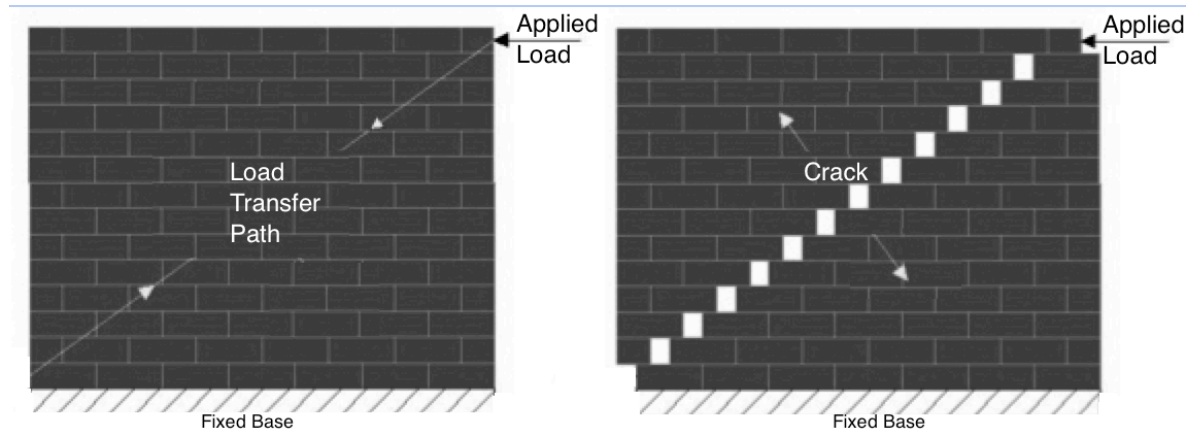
Diagonal shear crack in wall follow load transfer path
